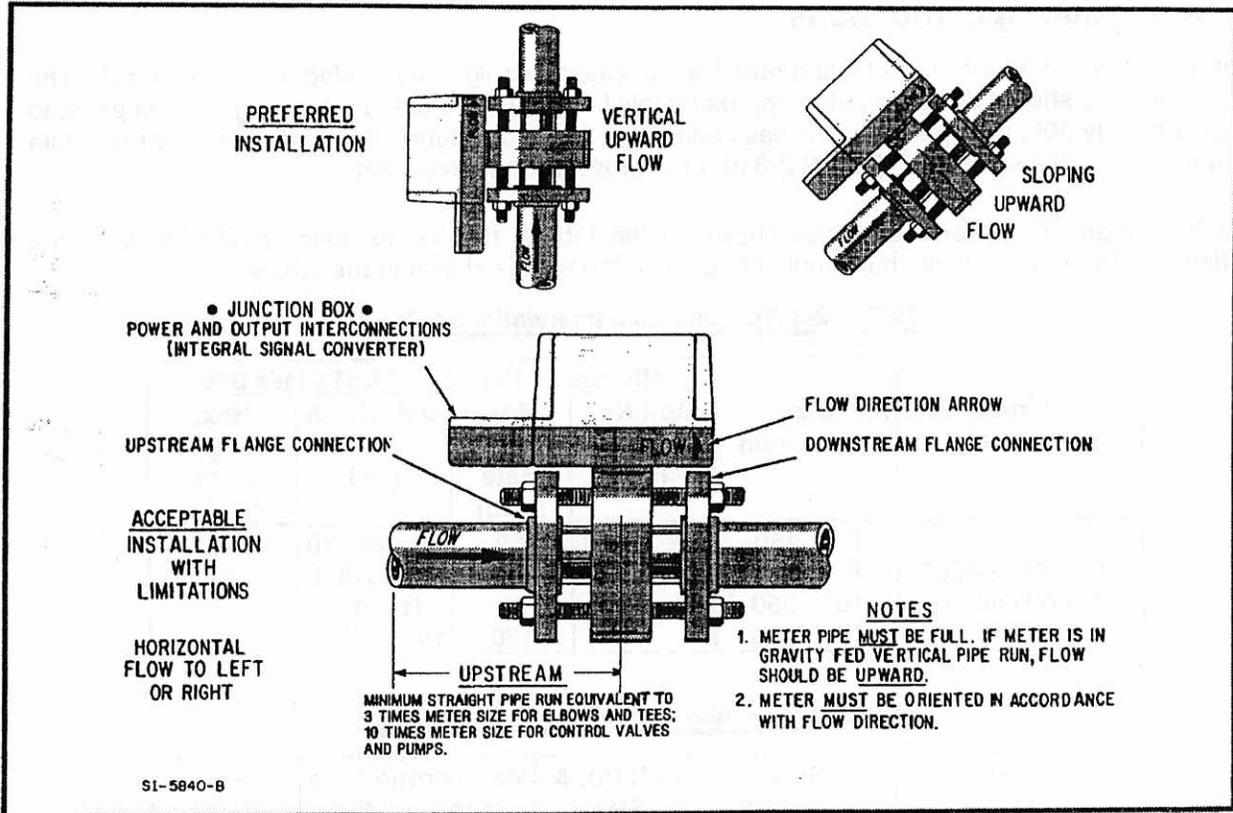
RECOMMENDED PIPING ARRANGEMENT
